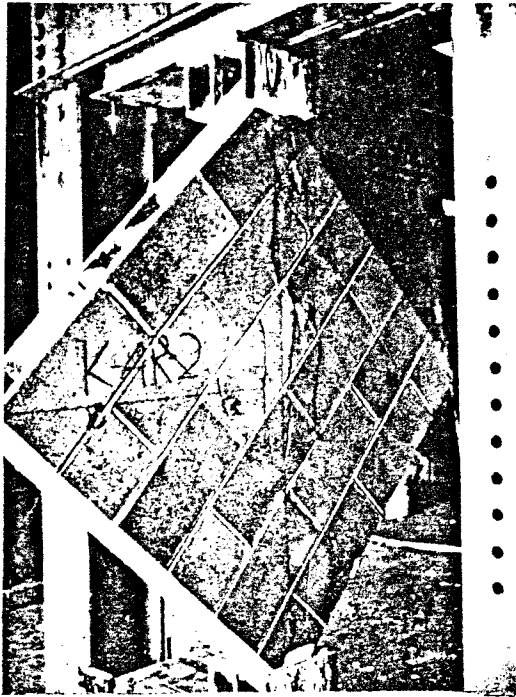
Racking Test at failure. Specimen conventionally constructed (without Korfil Inserts) and Reinforced with 1 #4 at 24" on Center.
